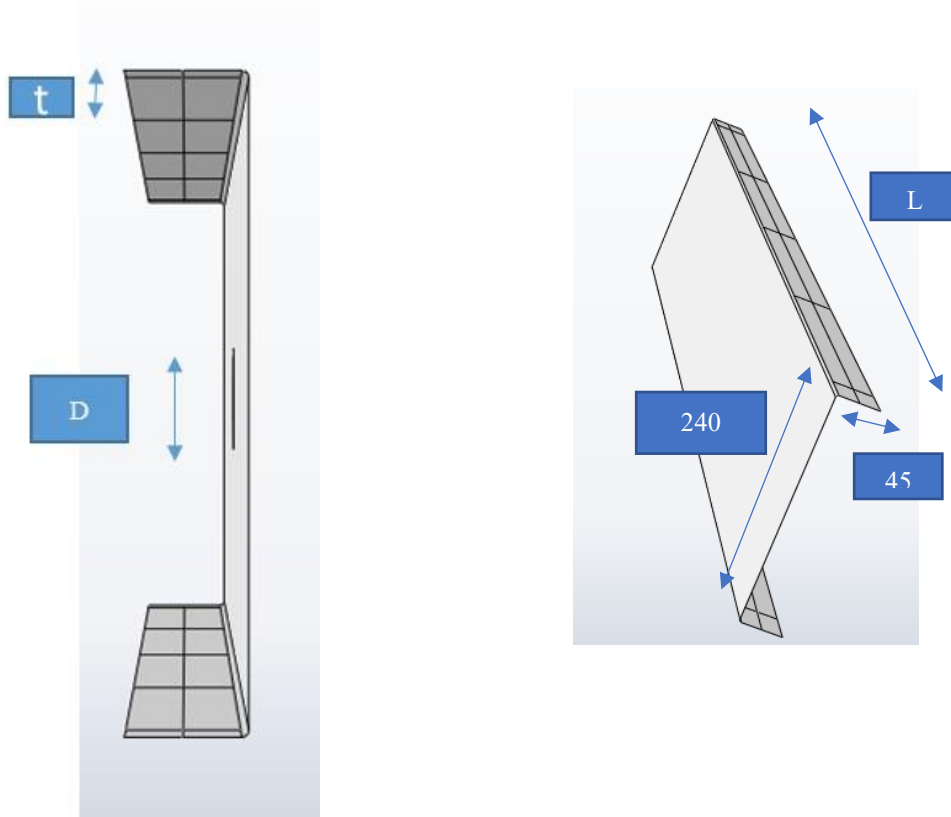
Cross-sectional details of channel for plain and web hole at centre (All dimensions are in mm)
